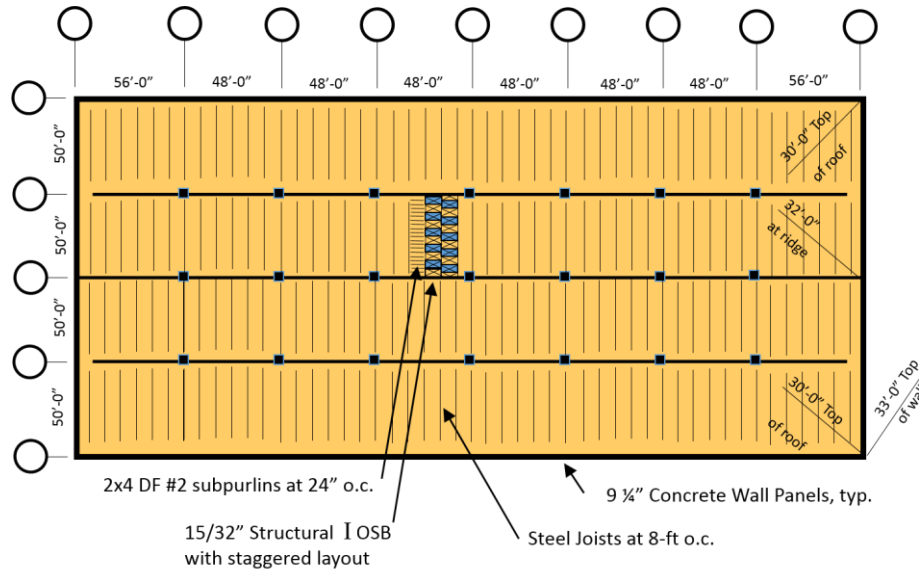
Plan view of an archetype tilt-up building representing modern era construction.
